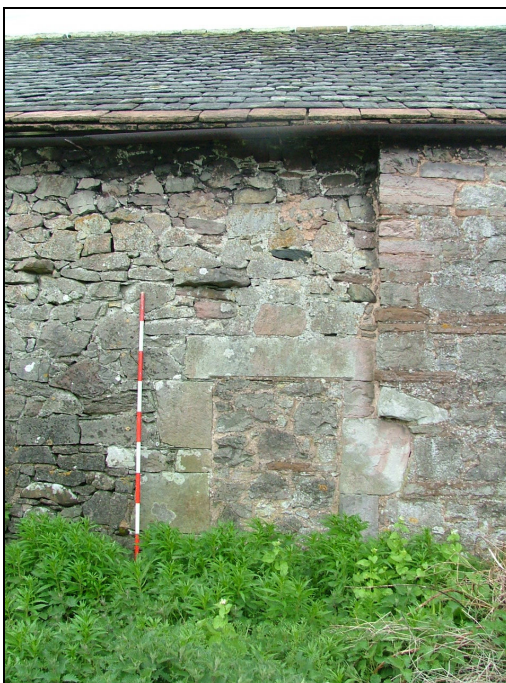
Blocked doorway, north-west elevation of Building 1 (Scale = 2m)
